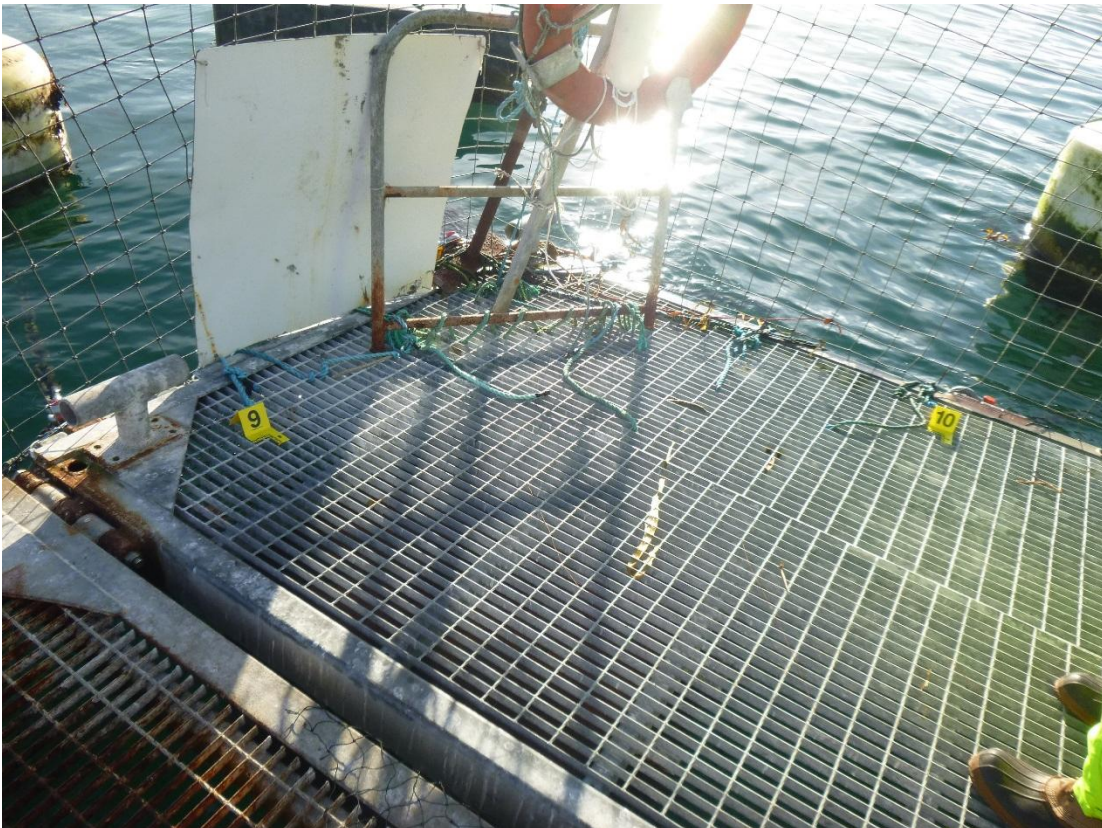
Anchor 9 and 10 Showing Uneven Freeboard Looking Southeast
